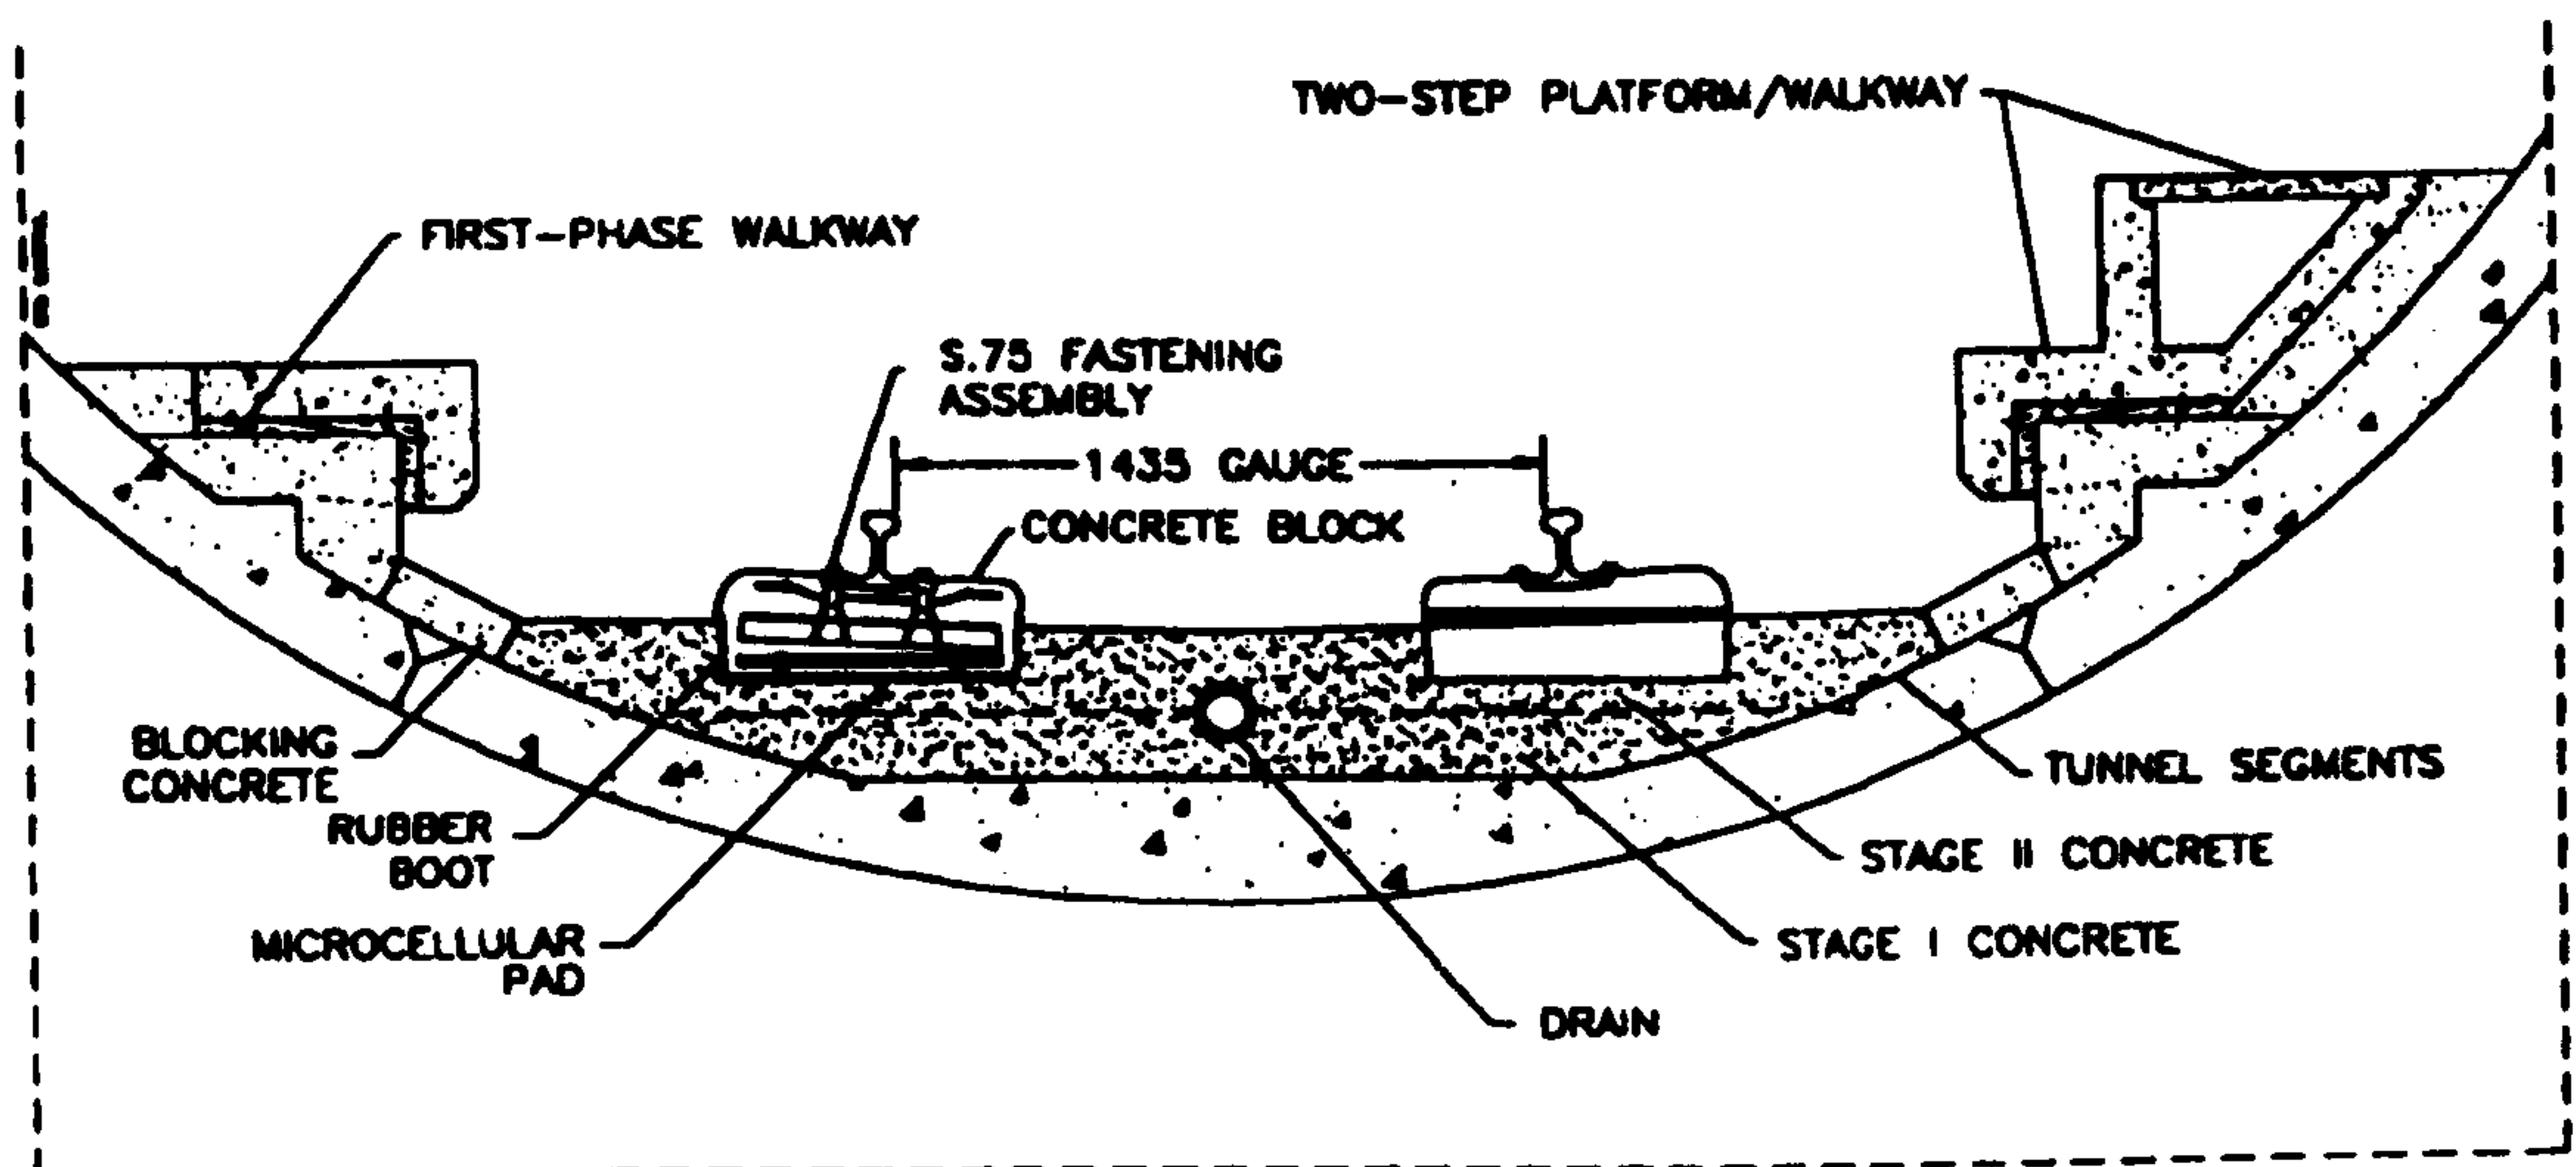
Paved concrete slab track (PACT) with the rail supported by twin-block, used for the Channel Tunnel.
